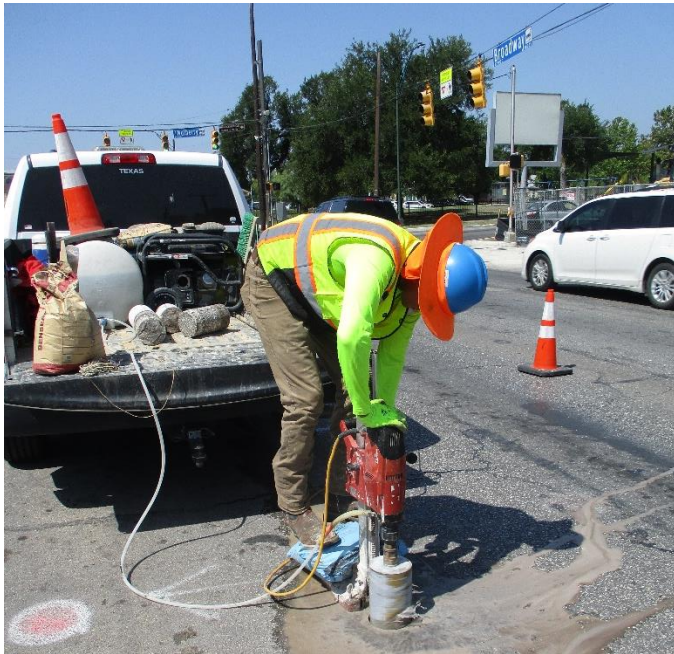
View looking towards coring/boring operations of B-4 performed at North of Broadway St and E. Mulberry Ave. Intersection
